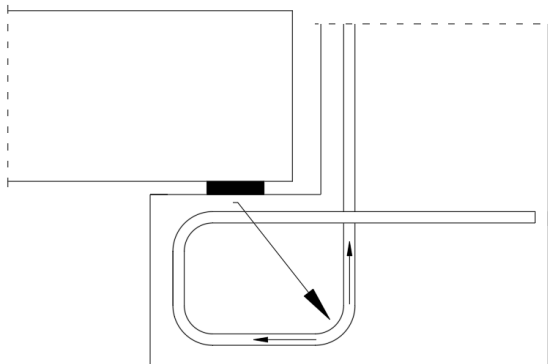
Equilibrium of connection by bending the longitudinal reinforcement towards the connection half-joint.
